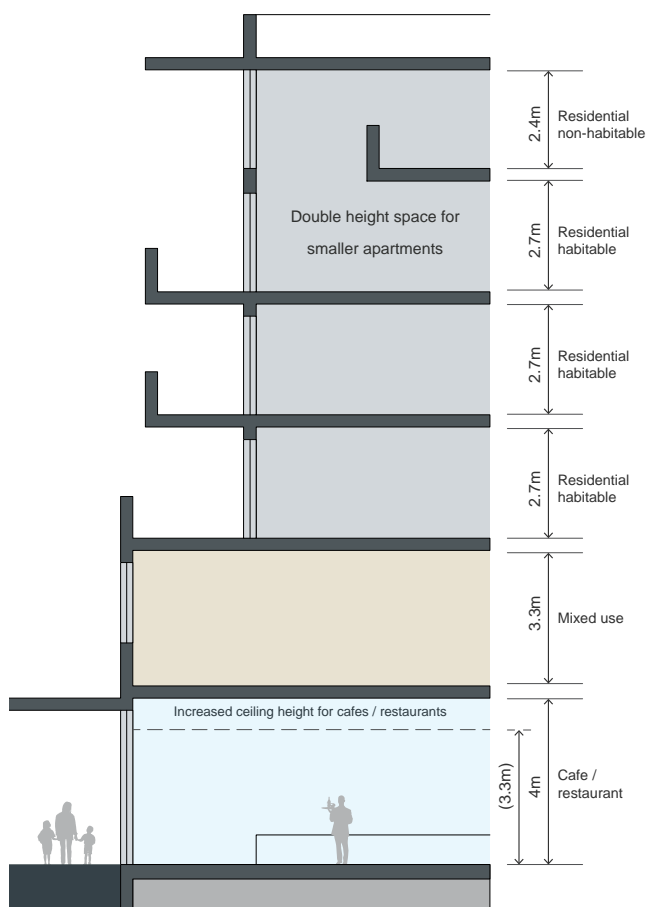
C.1 Greater than minimum ceiling heights for retail and commercial floors of mixed use developments are encouraged to promote flexibility of use. Cafe and restaurant uses need greater minimum ceiling heights of 4m to allow for additional servicing needs
